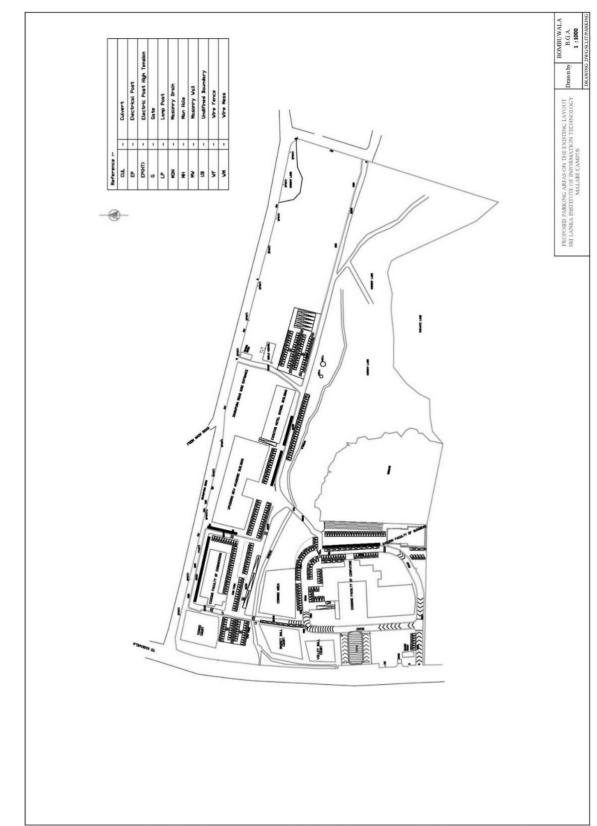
Proposed Improvements for Parking Infrastructure to Meet the Demand in 2025
